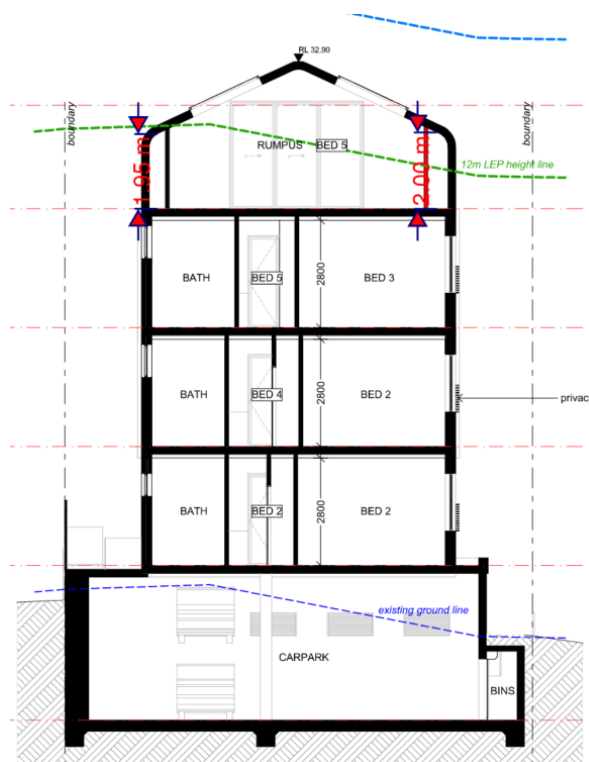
Short section showing additional floor area to the northern and southern sides of the attic floor (Source: Archispectrum)
